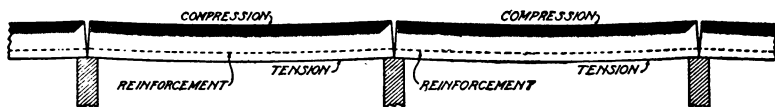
Series of Disconnected Beams or Slabs Resting on Supports and Deflecting Under Load
